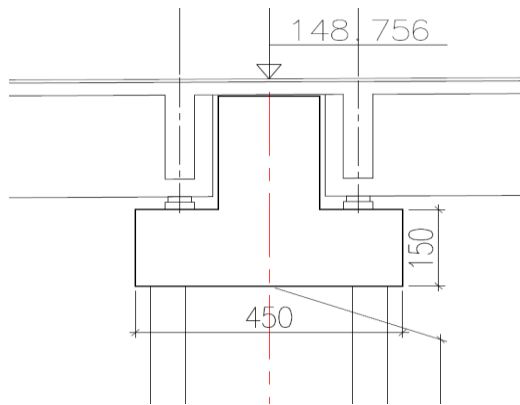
Profile view of pier axis P1 to show the pier cap details
